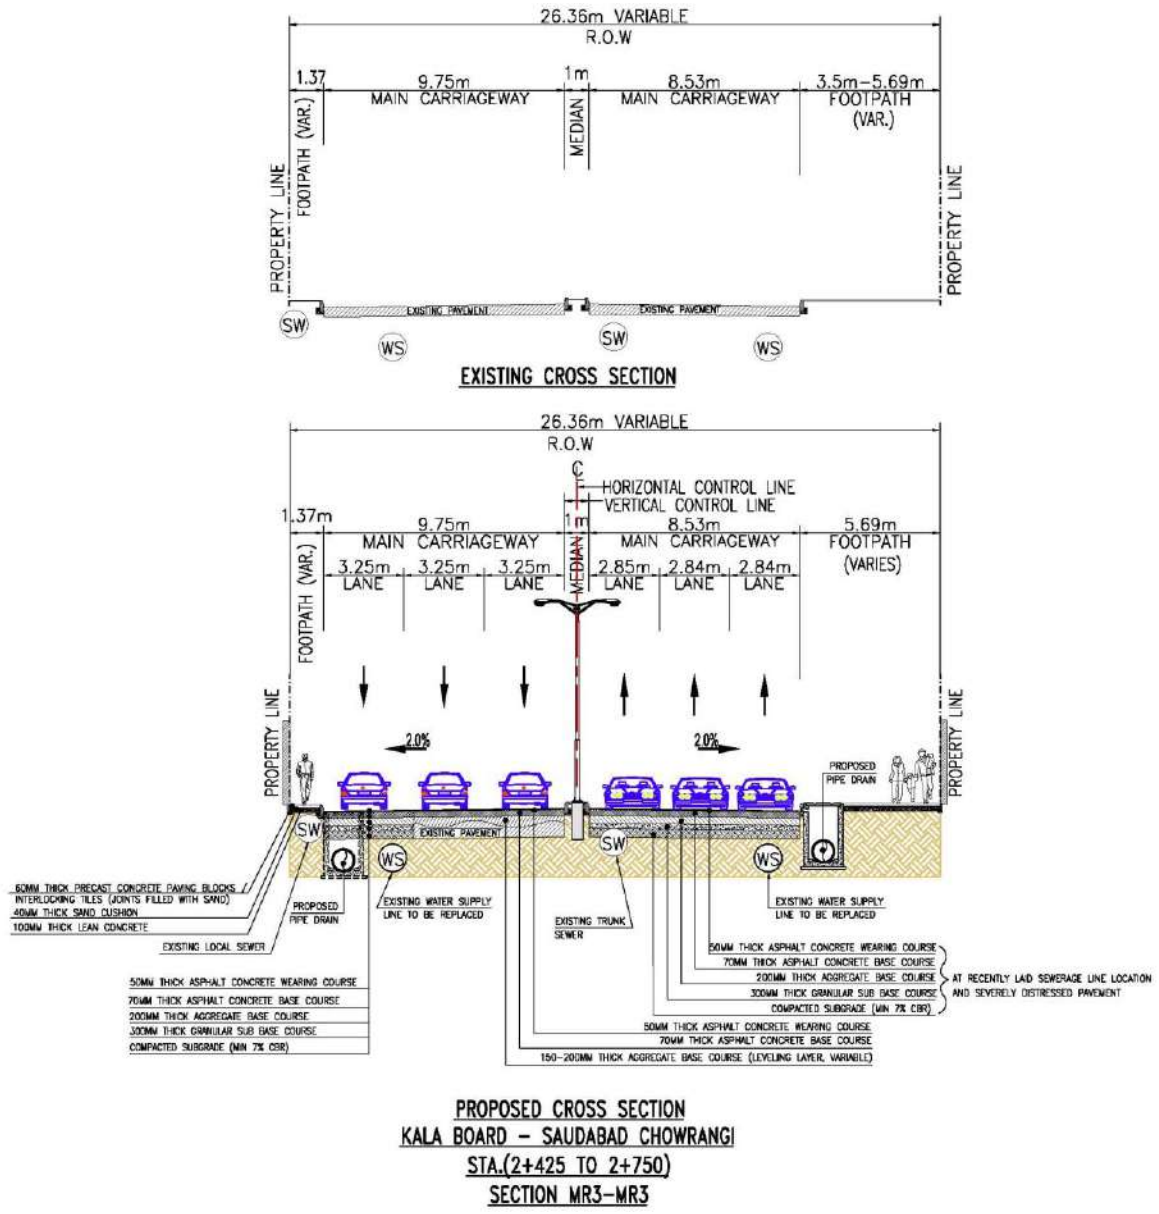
Existing and Proposed Cross Section of Kala Board to Saudabad Chowrangi (2+425 to 2+750 km)
